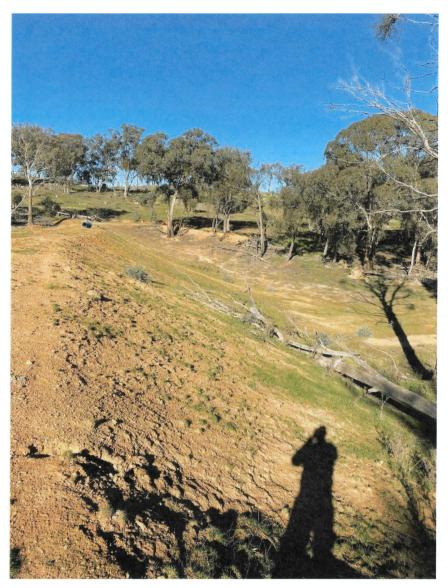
Evidence of tension cracking along eastern side of top of dam embankment. Facing North.
